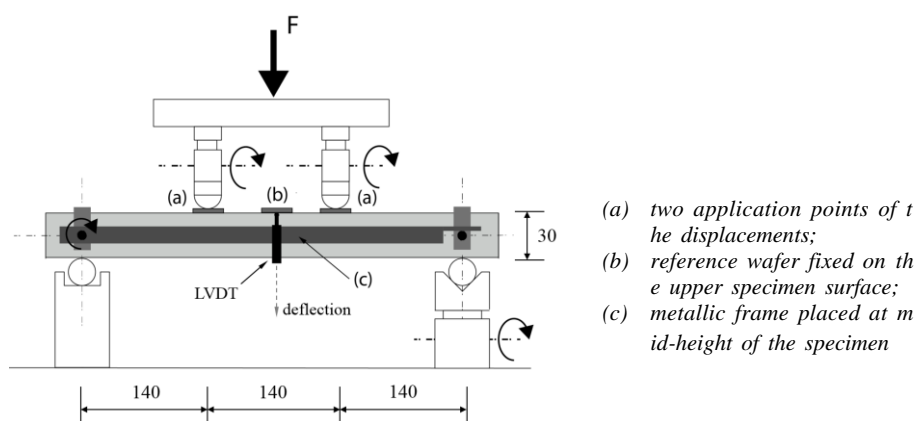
Four-point bending test setup and instrumentation (unit: mm) [24]
